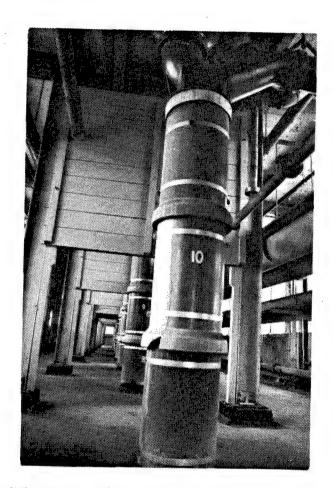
Building 105-1: Wringer base, constructed of concrete pipe and insulated by a ceramic coating, located on the first level of a Nitrating House.
